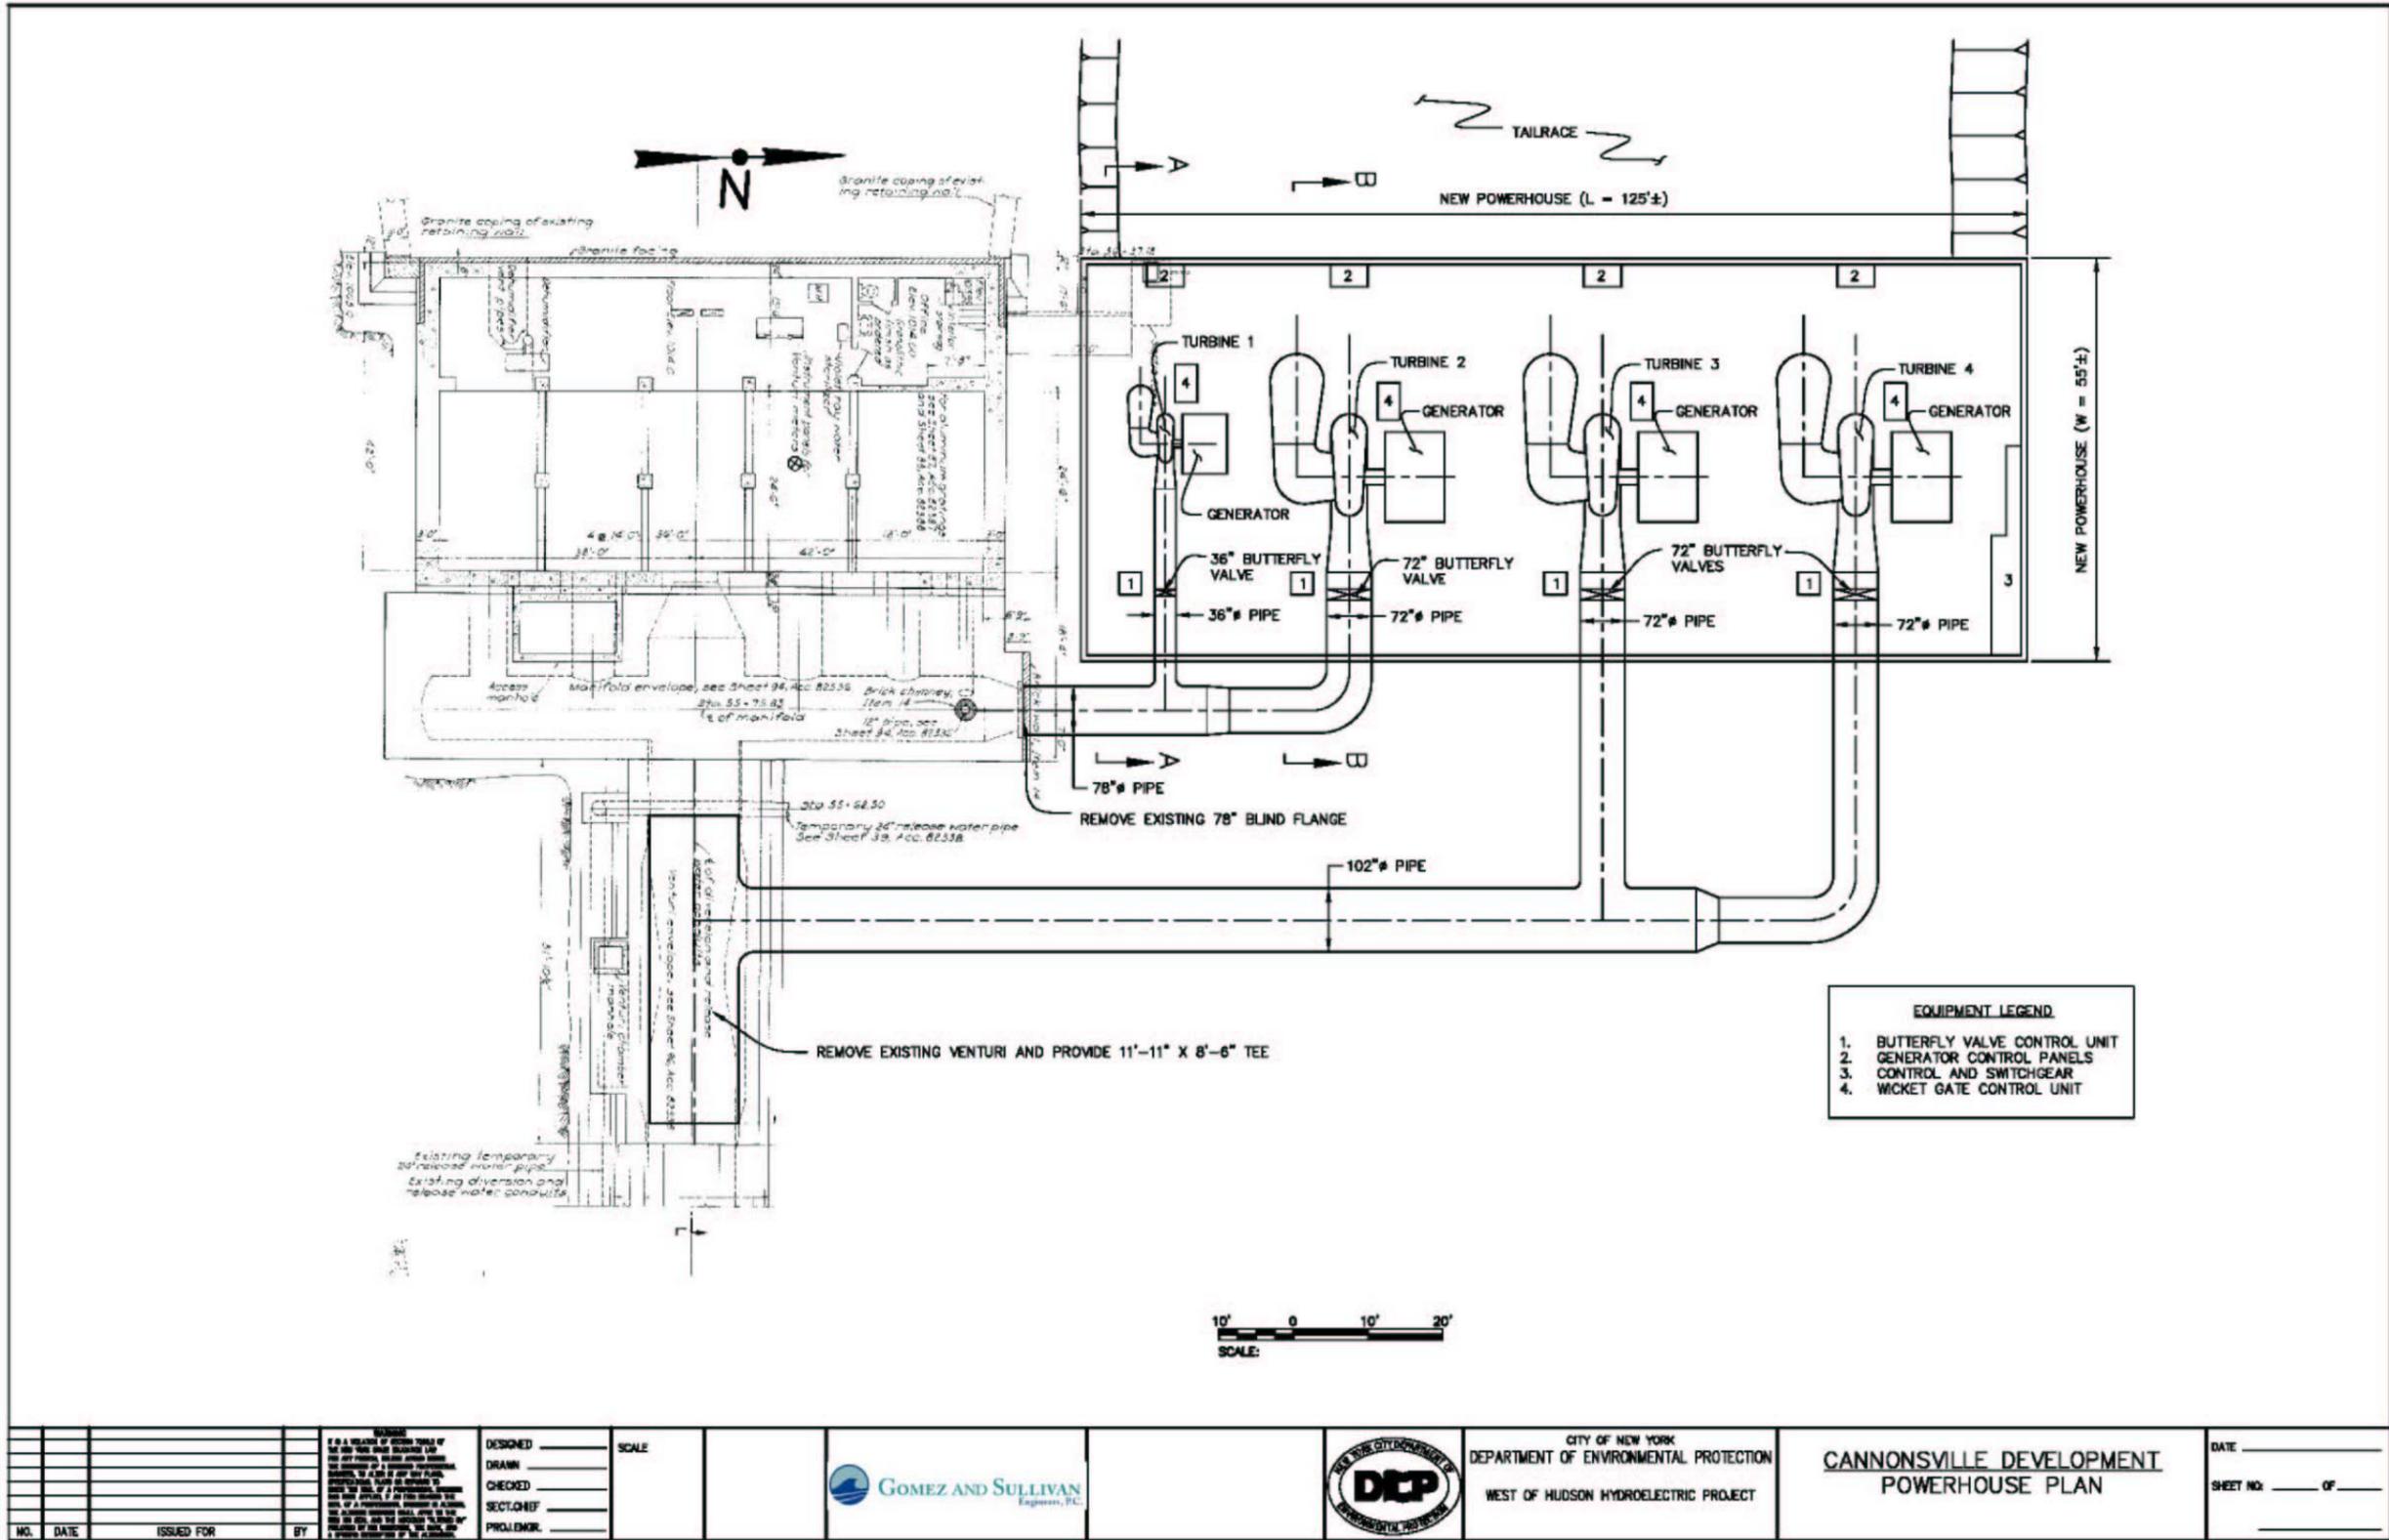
Cannonsville Development Powerhouse Plan
